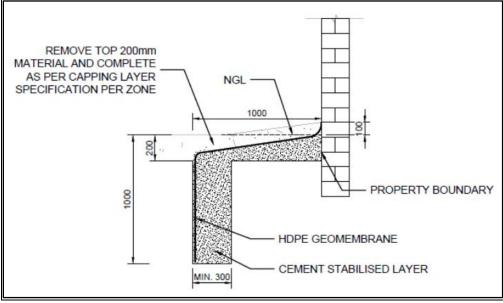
Typical cross-section of proposed rodent barrier (source: Walters, 2020)
